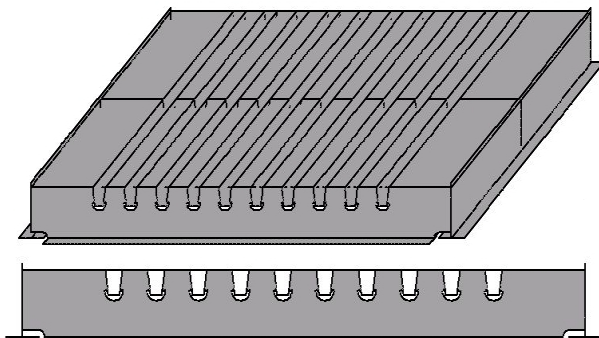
Finite element model of an orthotropic plated bridge deck.
